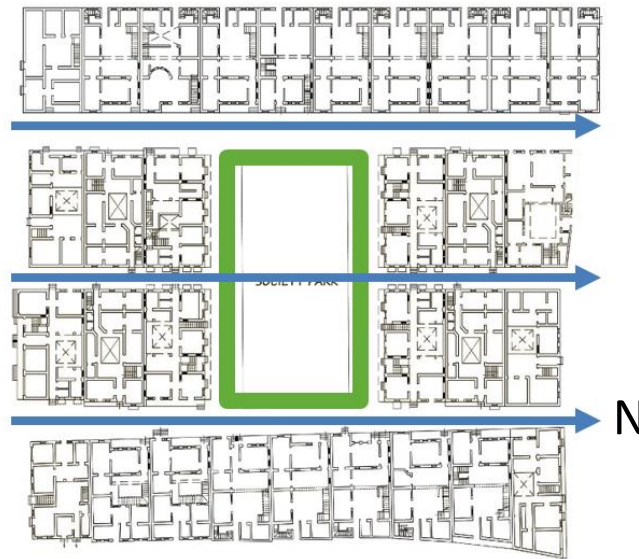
Site Plan illustrating the street orientation of the studied settlement
